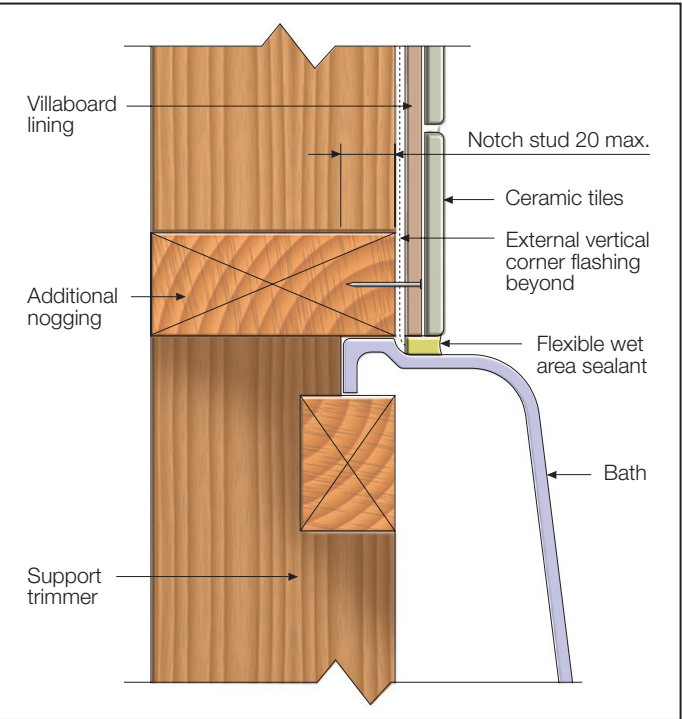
A BATH EDGE DETAIL - VILLABOARD LINING TO BE FINISHED WITH TILES - TIMBER FRAME
